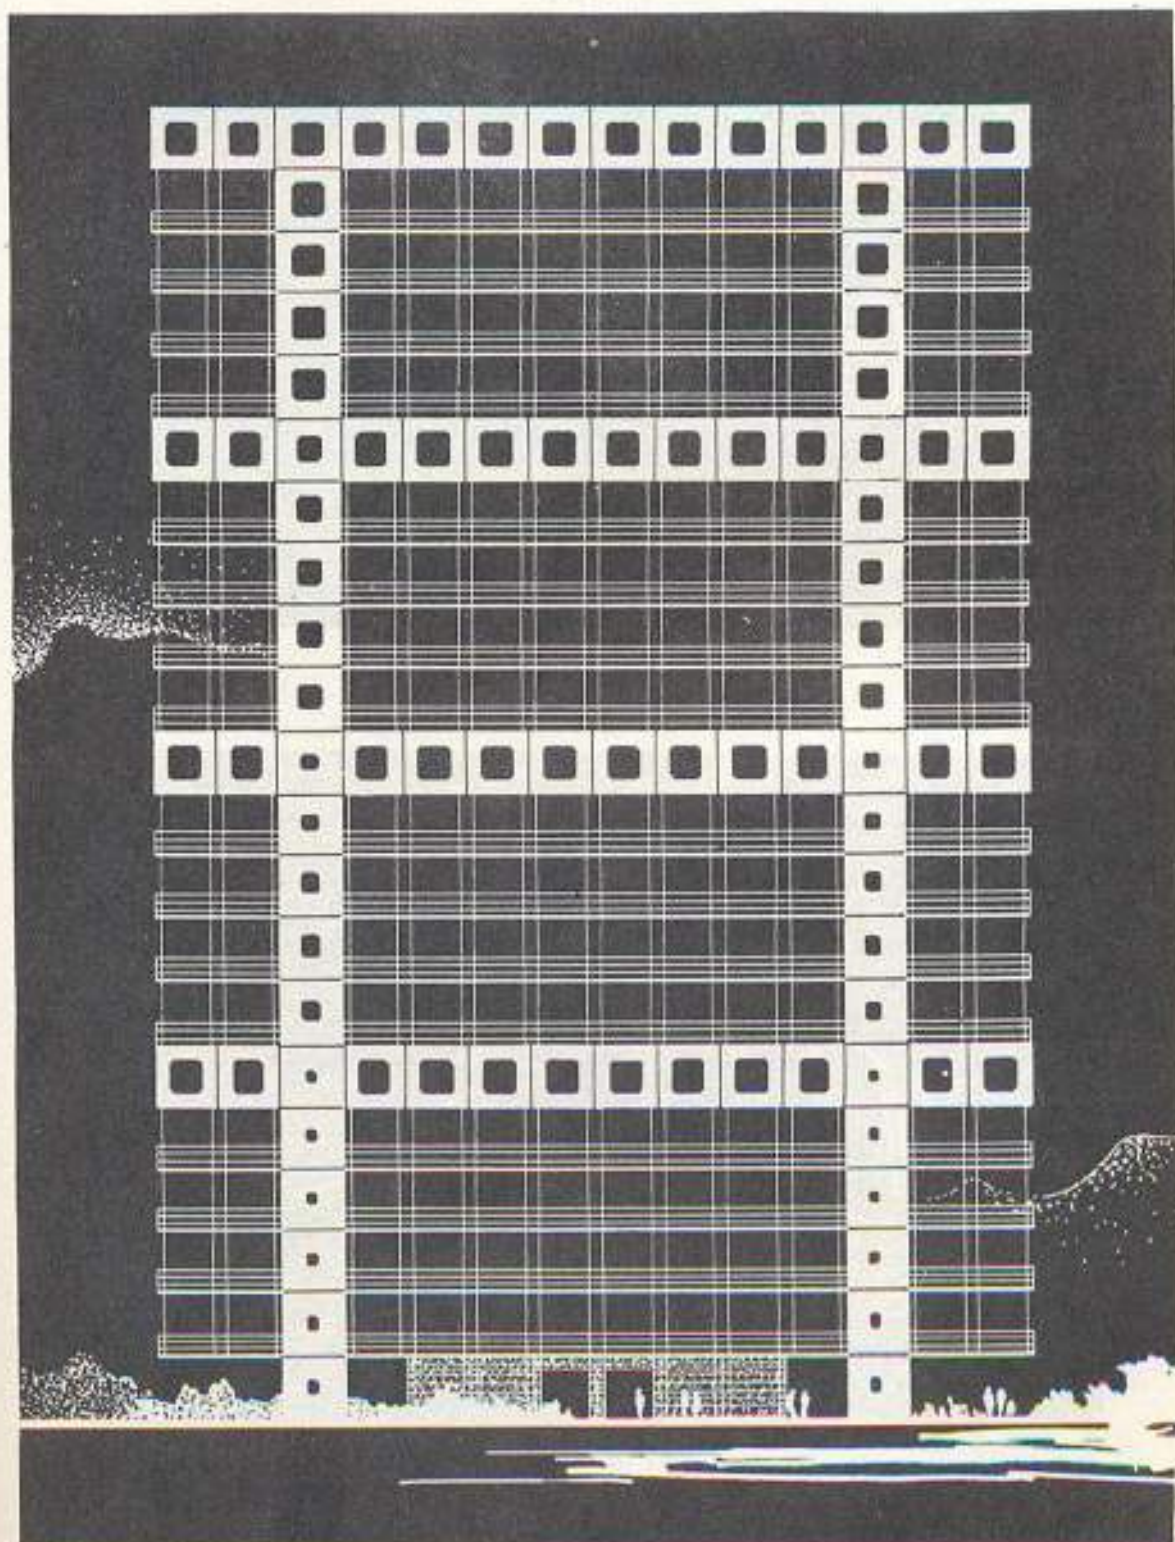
A tall building with floors suspended from prestressed, precast girders.
